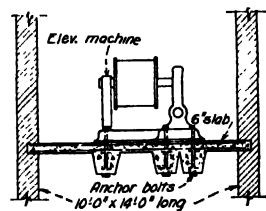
Section of elevator machinery floor of concrete on steel beams encased in concrete.
